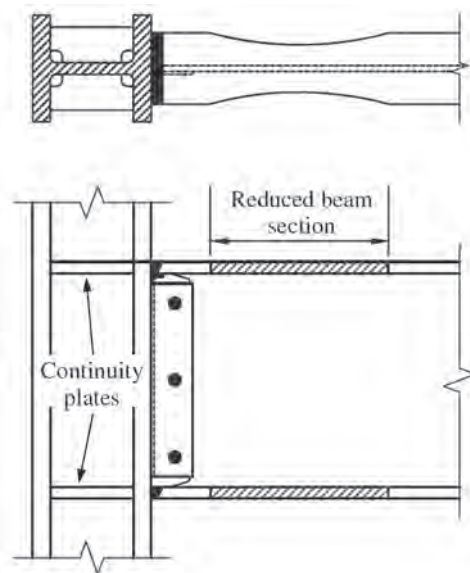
Reduced beam section (RBS) moment connection with continuity plates.
